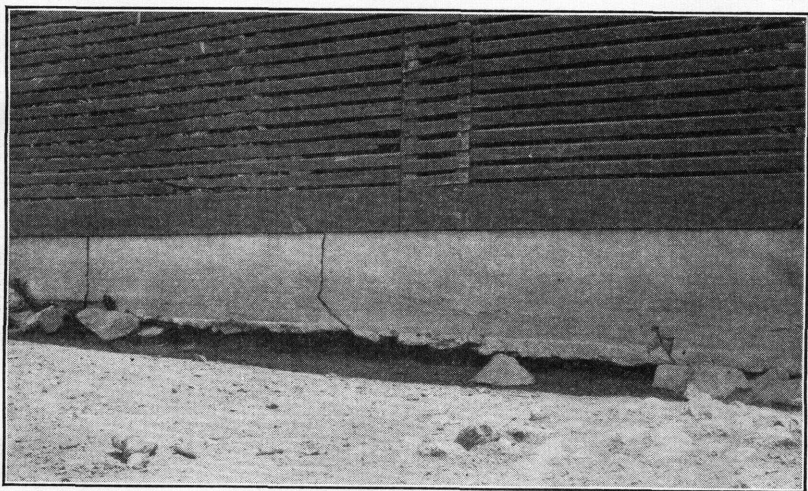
Shallow foundation made insecure by washing away of soil underneath
